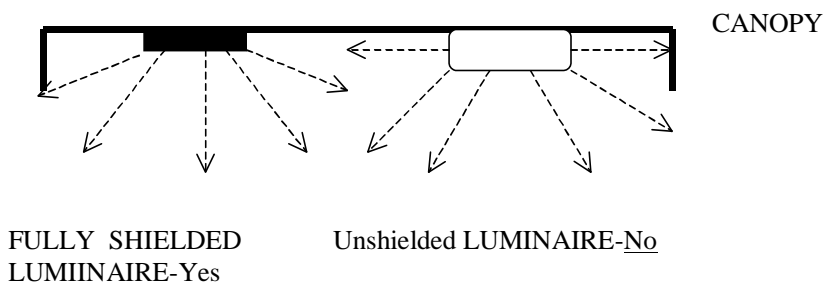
Building canopies, overhangs, roof eaves and similar types of construction shall not be considered as the means for providing the light cutoff. The cutoff characteristics shall be achieved by the LUMINAIRE itself.
